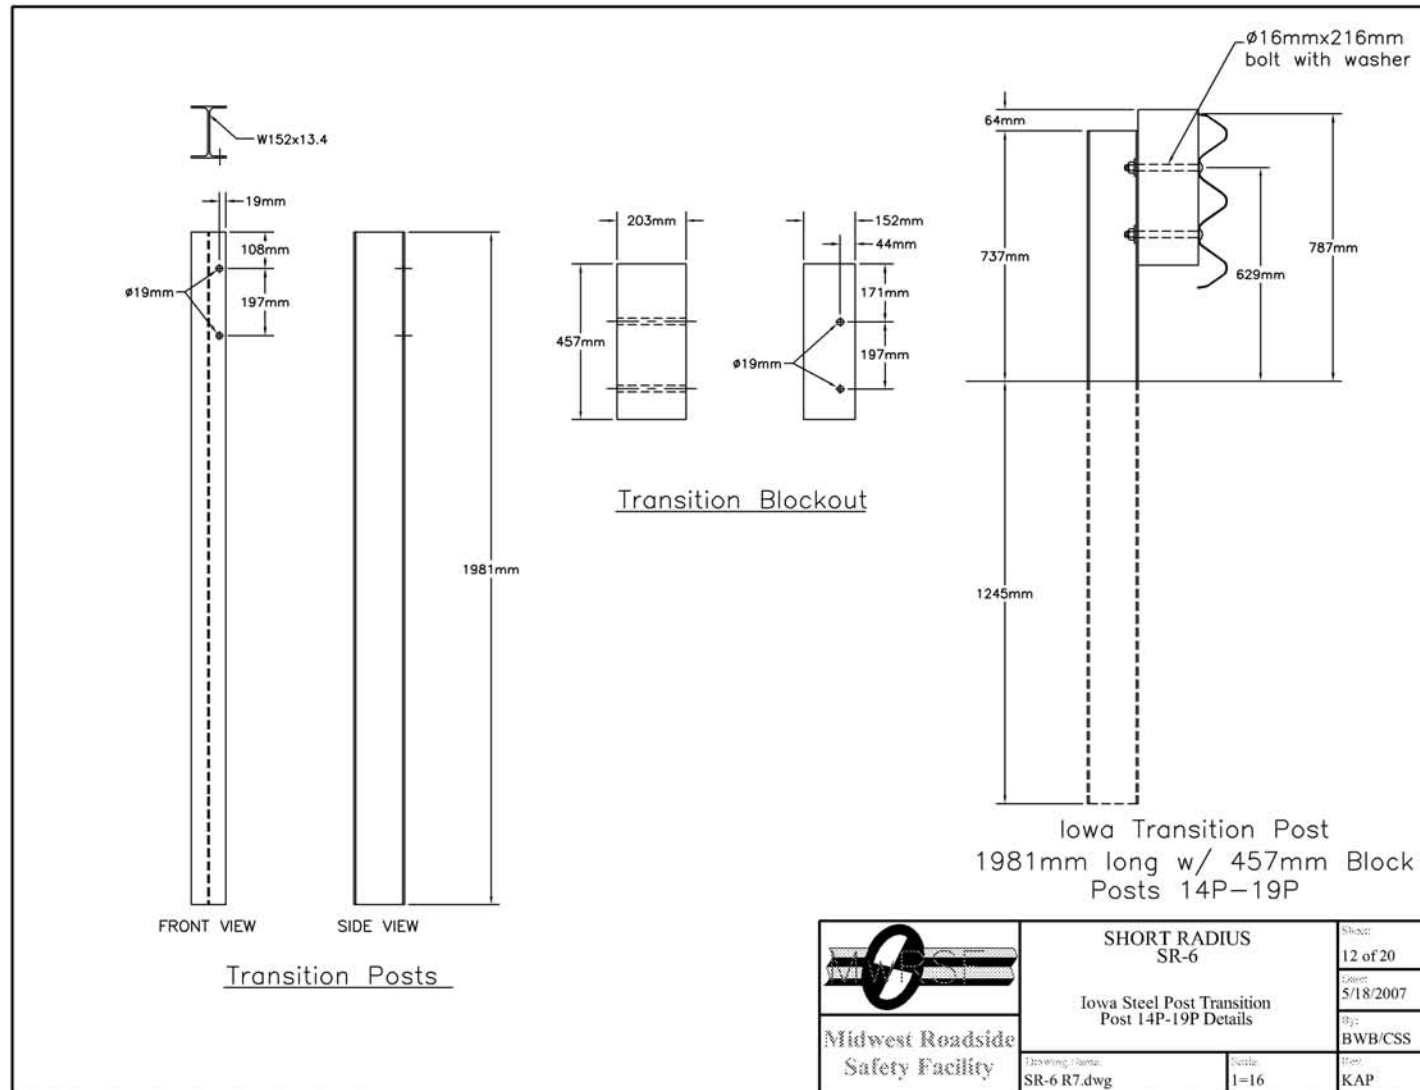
Iowa Steel Post Transition Details, Test SR-6
